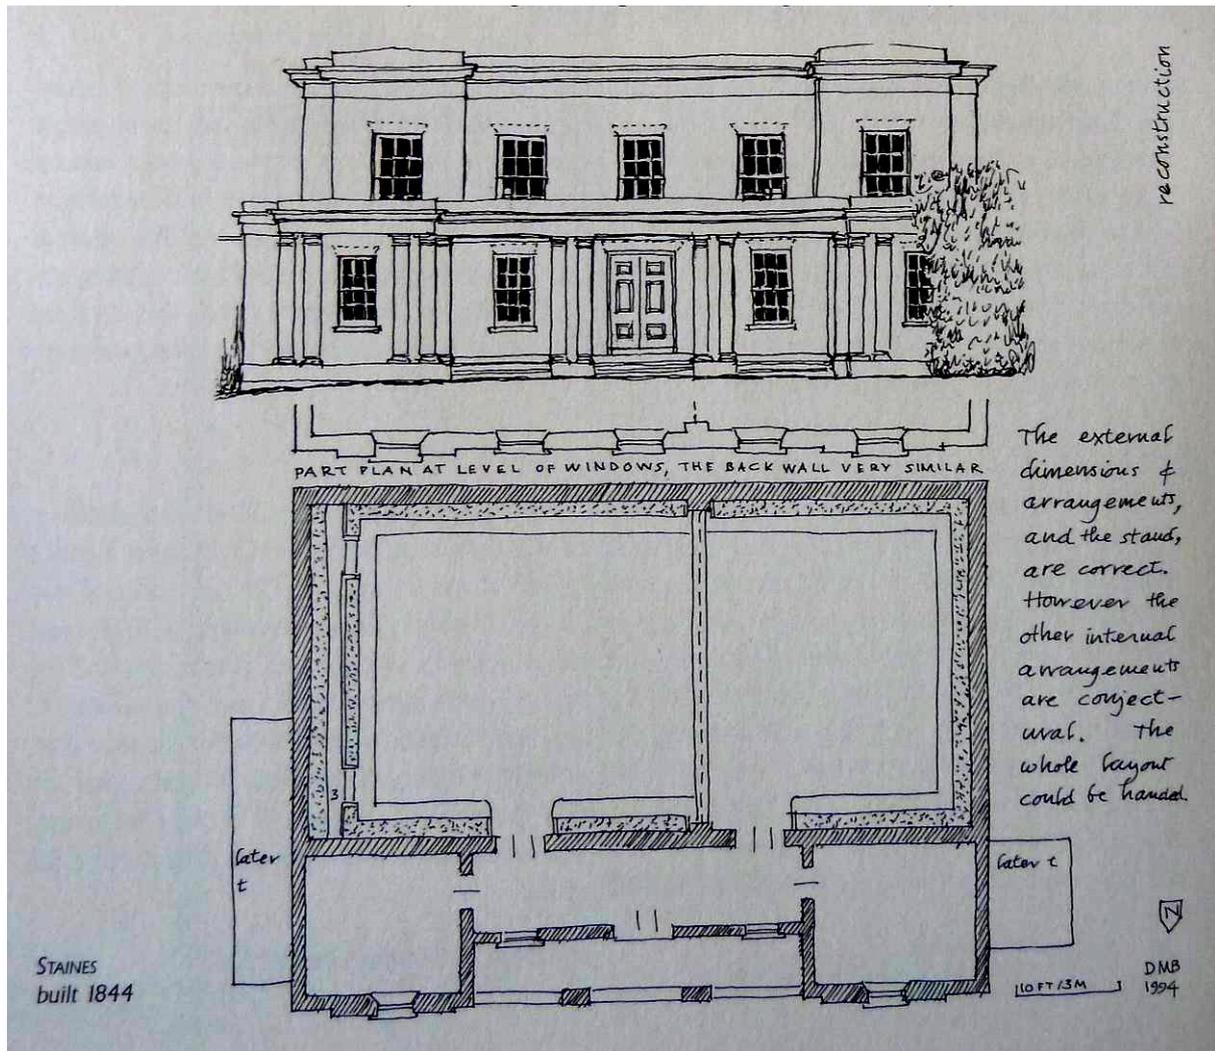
Plan and elevation of the 1844 Staines Meeting House (from Butler Vol. 1, p. 418)
